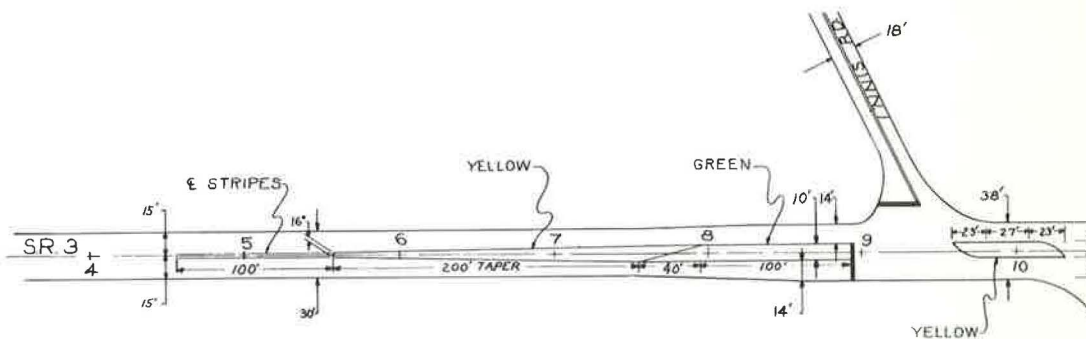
The intersection of SR 3 and Innis Road showing details of colored asphalt.
